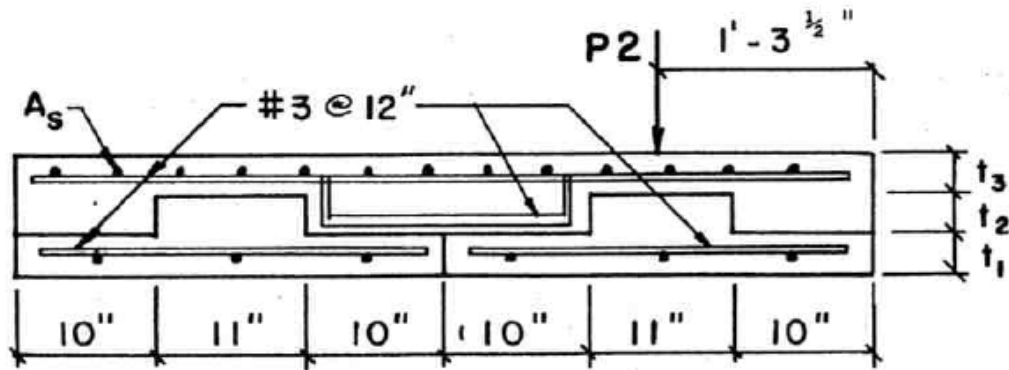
Cross-sectional view of the alternative span of the lab specimen used in the study performed by Hays, Jr. et al. (1980)
